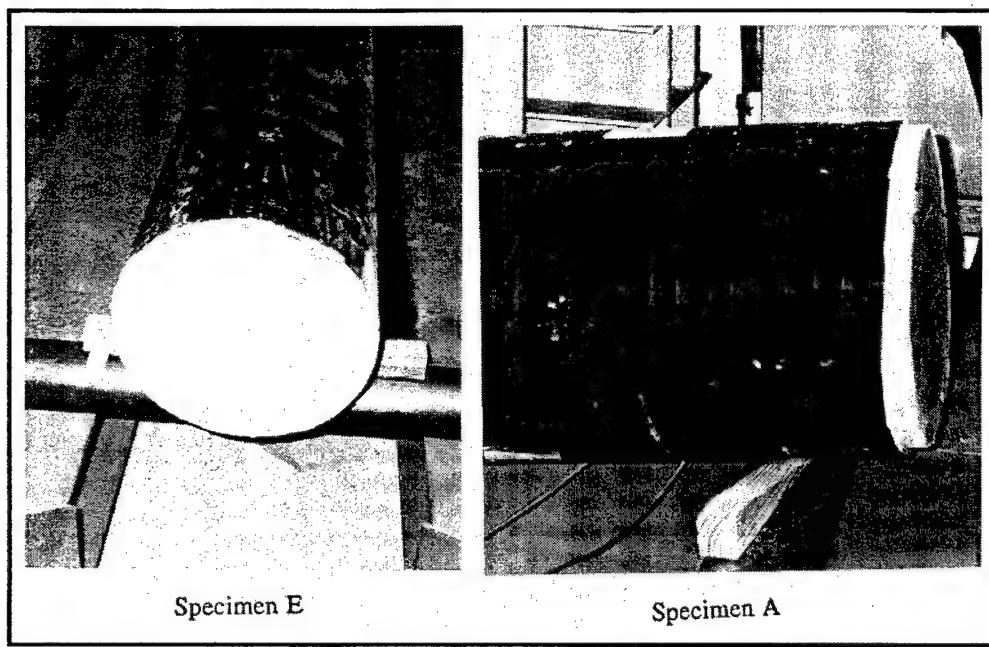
Slight protrusion of concrete core following conditioning of specimen to -20 °F for 24 hours.
